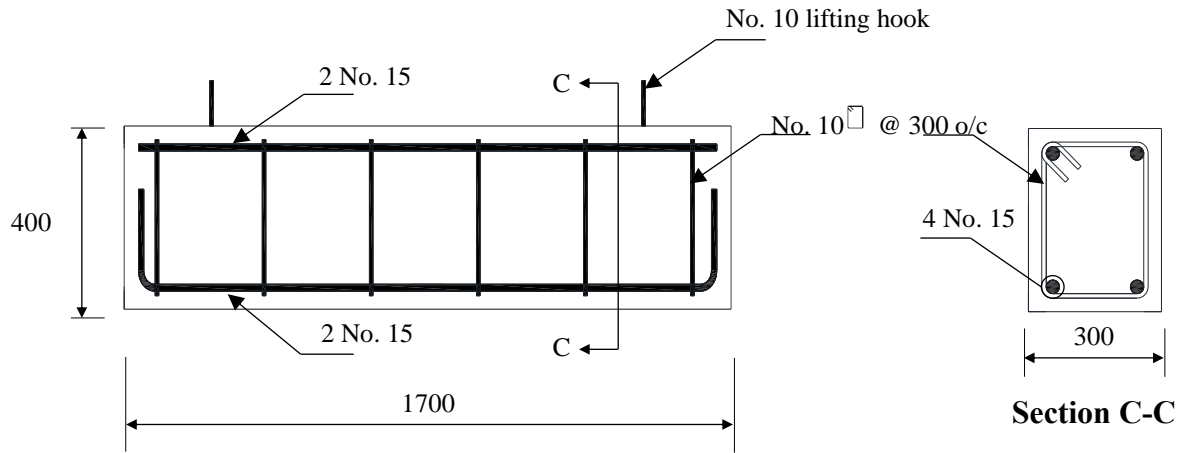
Typical concrete grade beam for UR and PGR walls (dimensions in mm).
